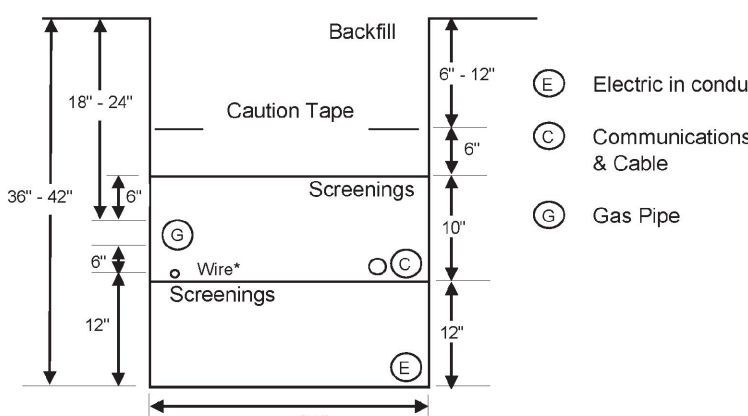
Recommended Common Trench Installation - Service Lines (not to scale)
